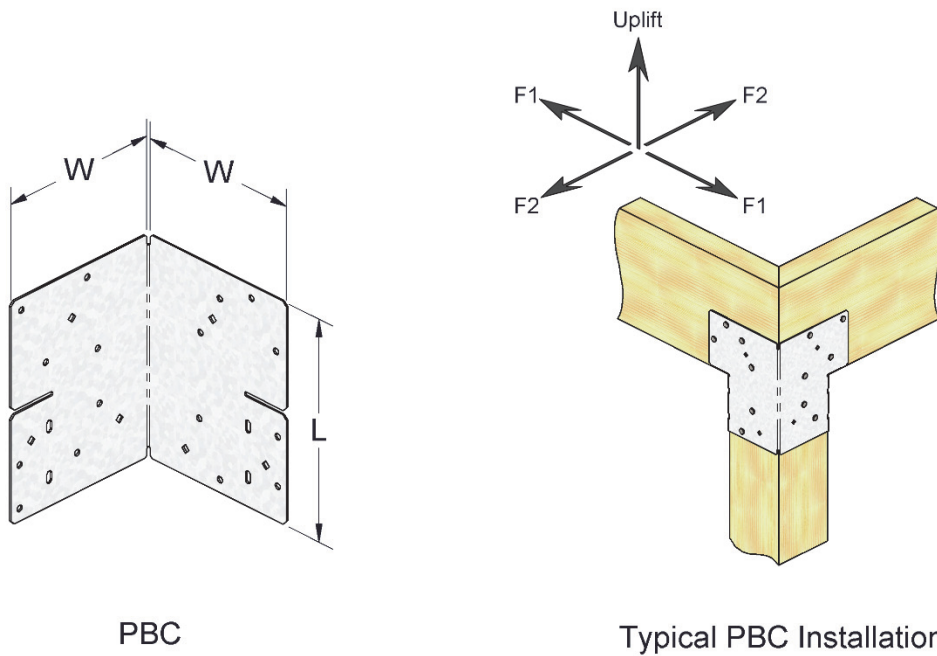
PBC POST BEAM CORNER CONNECTORS
